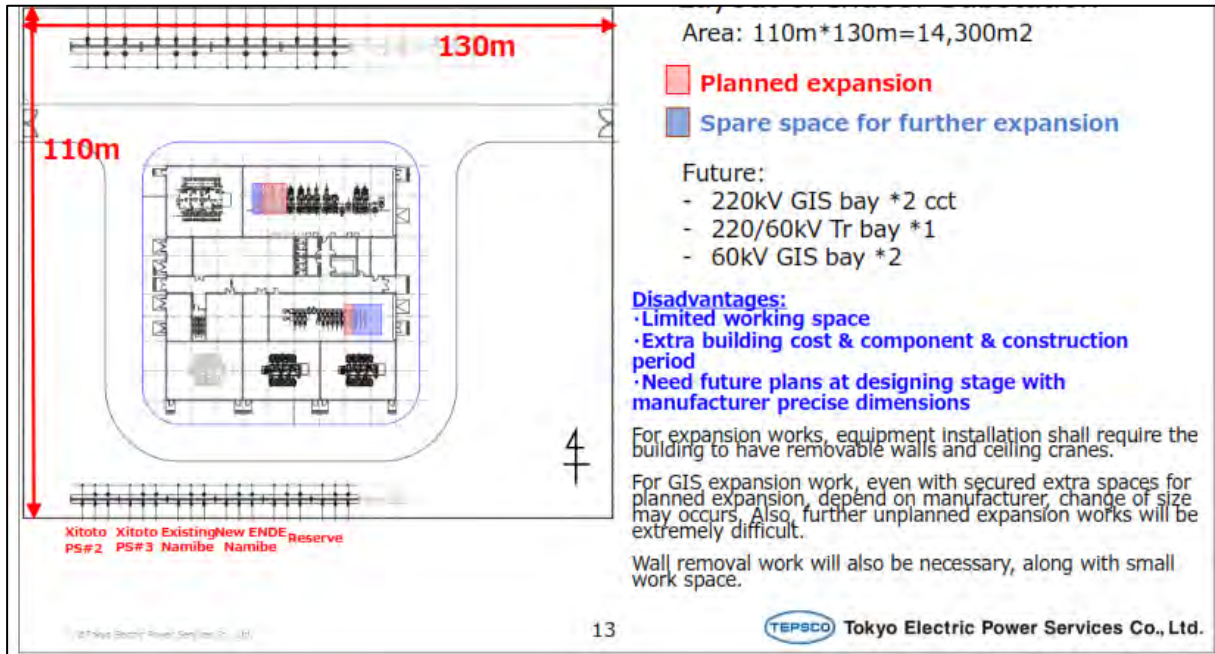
Layout of New Namibe substation (Second option). Source: JICA, 2021.
